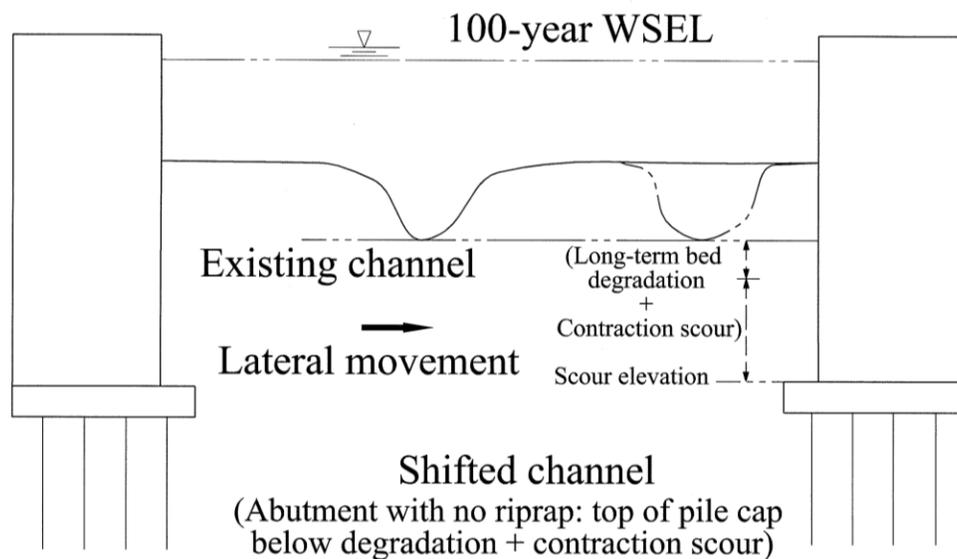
Design of Pile Cap for Deep Foundations within the Channel Lateral Movement Zone
